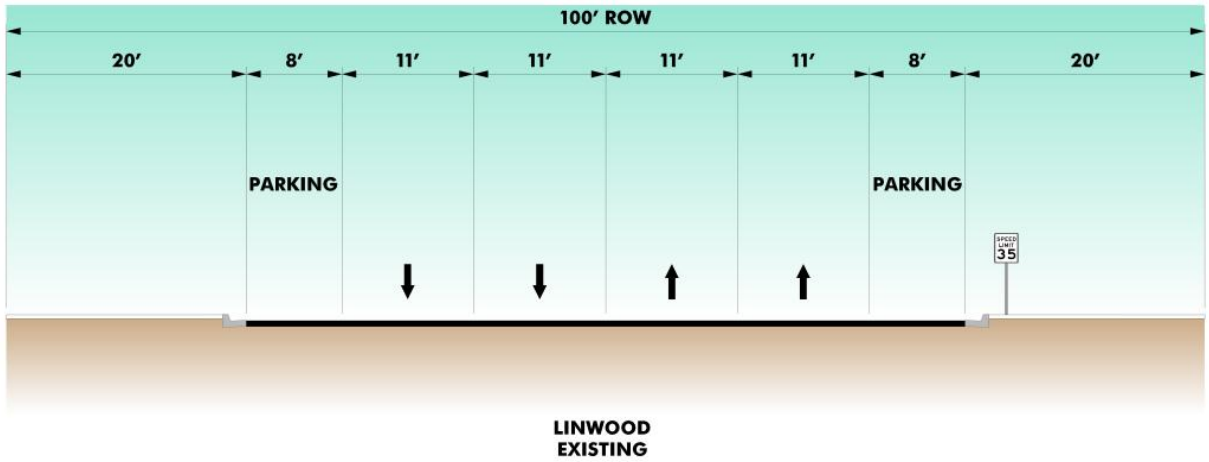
Bus Rapid Transit Linwood Blvd Typical Section, Existing Conditions
